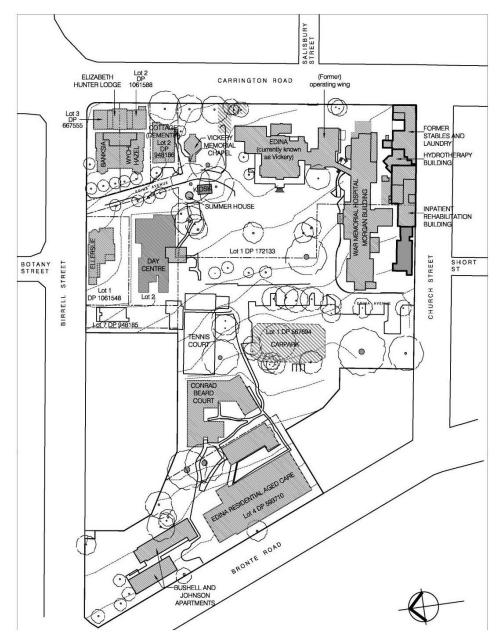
Site Location Plan for Uniting Waverley War Memorial Hospital Site. (Source: Hector Abrahams Architects.)
